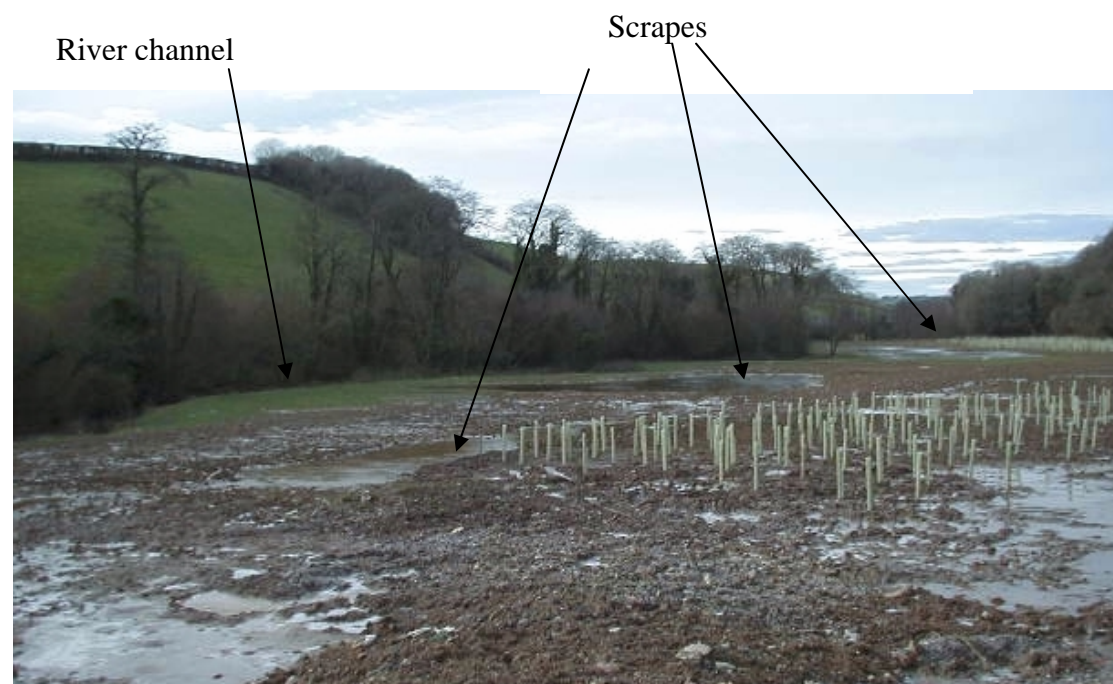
The newly created washland up stream of dam, with the three scrapes. New broad leaf woodland has been planted on the right which will merge with existing woodland. The open ground has been seeded with grass.
